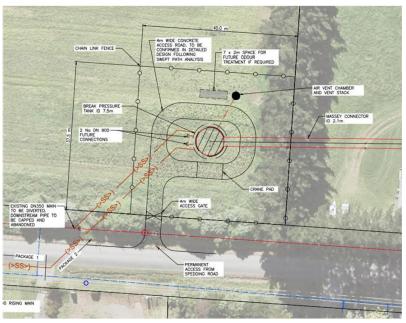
Break Pressure Tank Site Layout 8 Spedding Road
